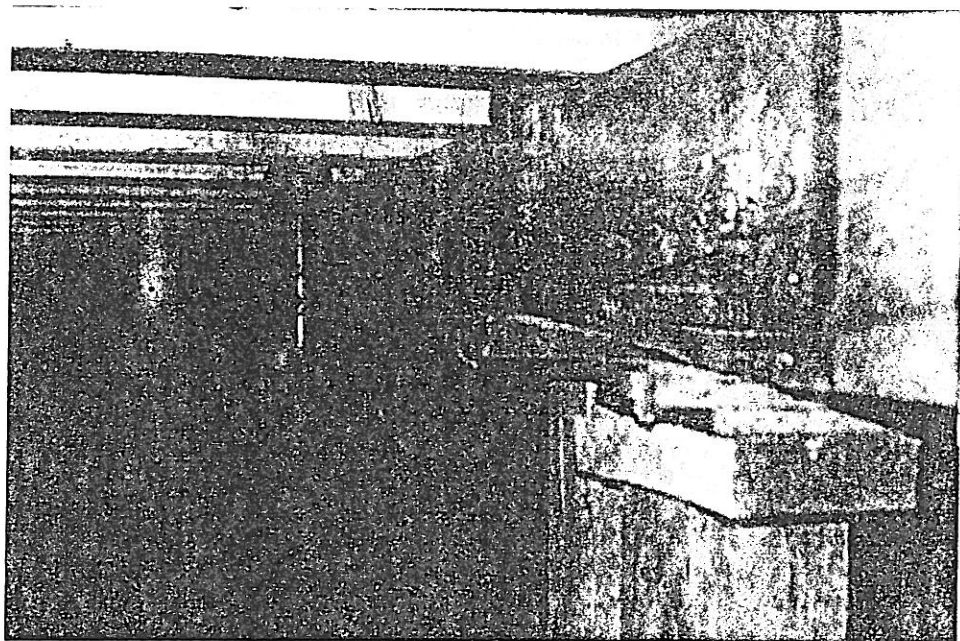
CRUSHING AND FAILURE OF MAIN BEAM DUE TO INSUFFICIENT BEARINGS ON SHIMS.
